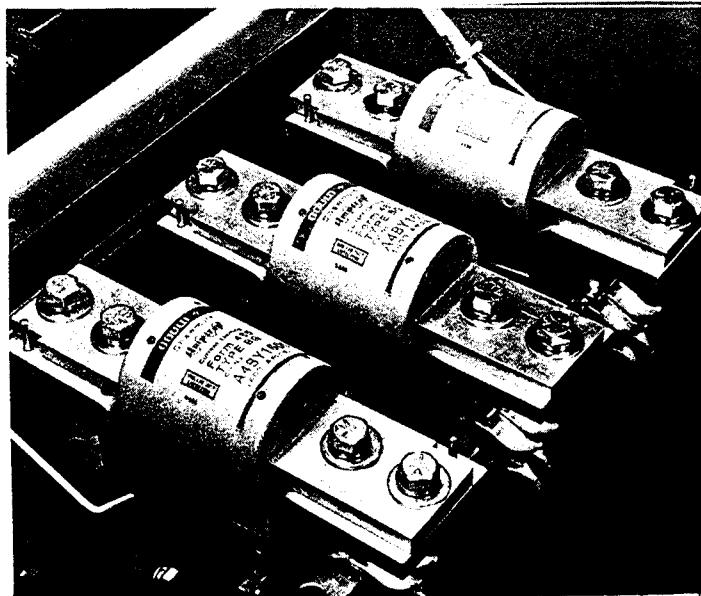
TYPICAL MOUNTING CLASS L FUSES
